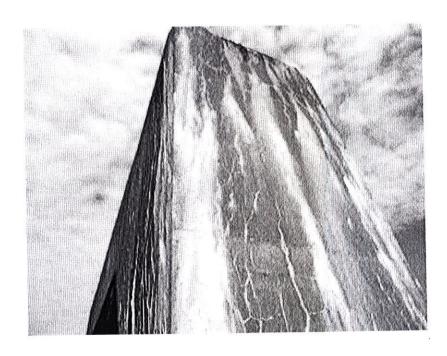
Photo 32 Appendix D Spall Above a Delamination on the South Face of Pier 11 Cap
